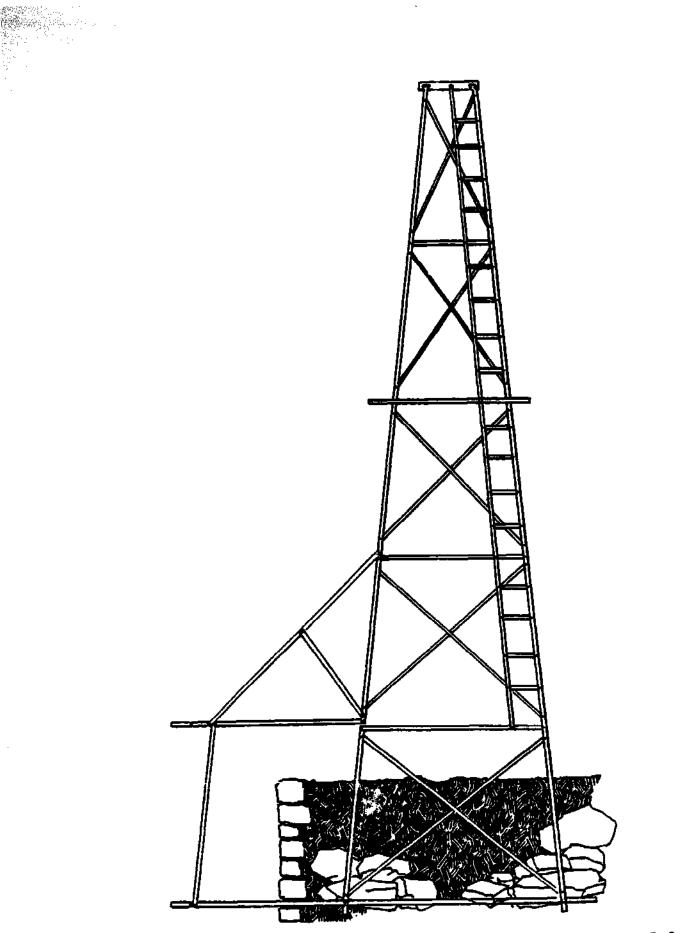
Side view of windmill tower showing upper and lower pipe supports, masonry wall, and stone tower footings
